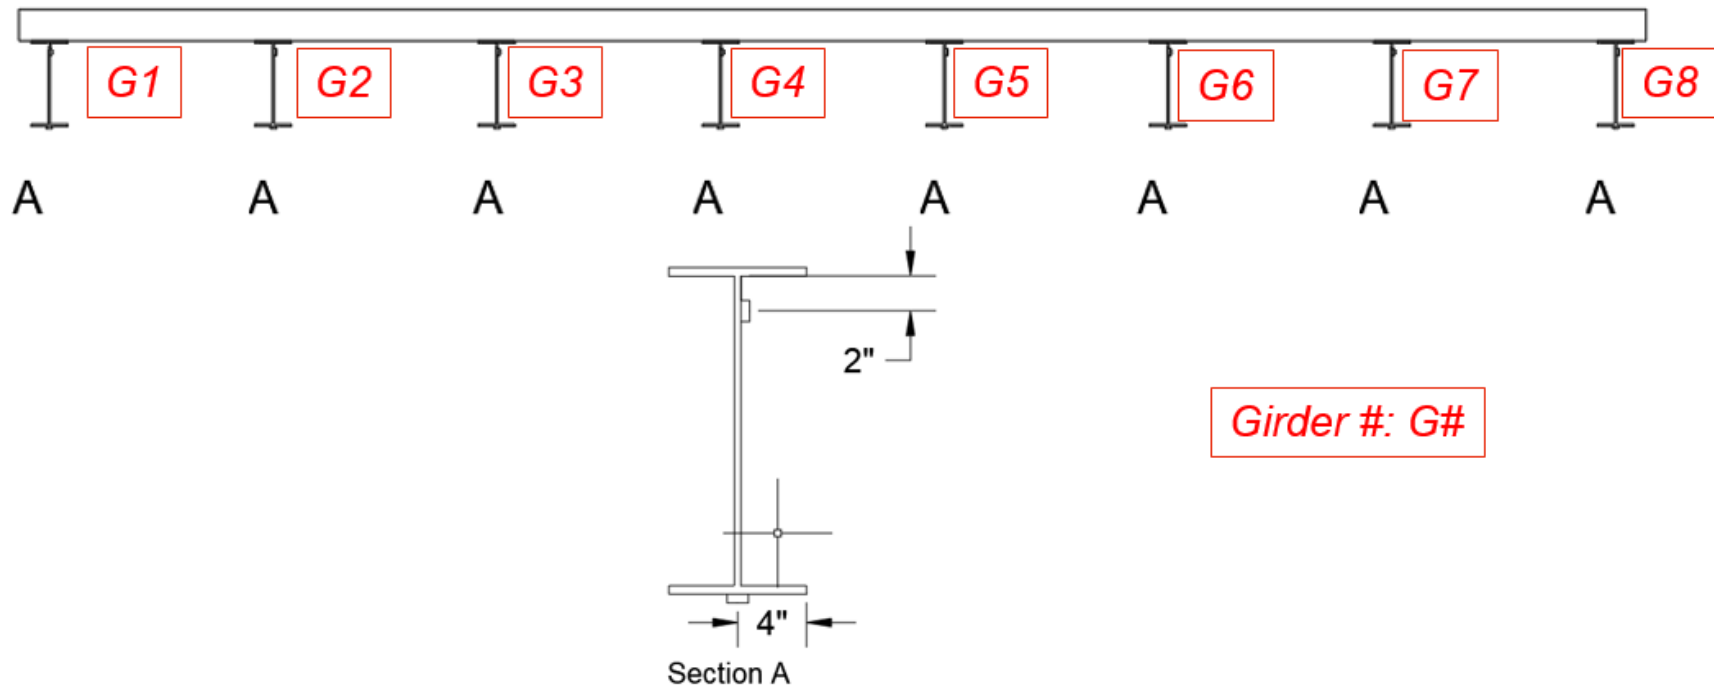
Cross-Section View of Sensor Layout (looking North) for 2<sup>nd</sup> Yutan Bridge Load Test
